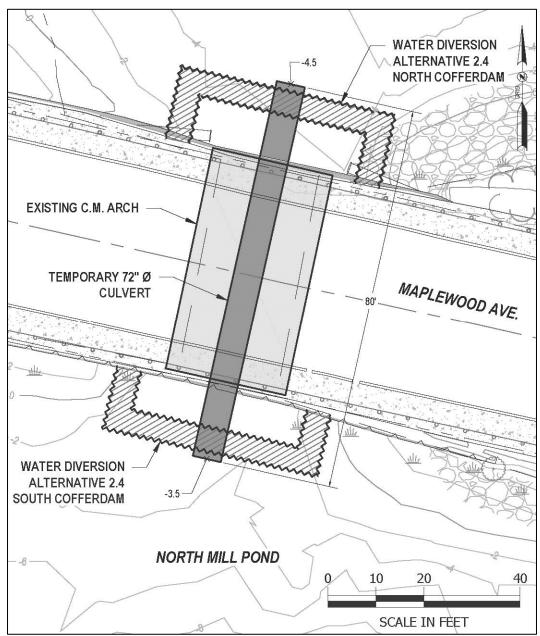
Water Diversion Alternative 2.4 Schematic Plan
